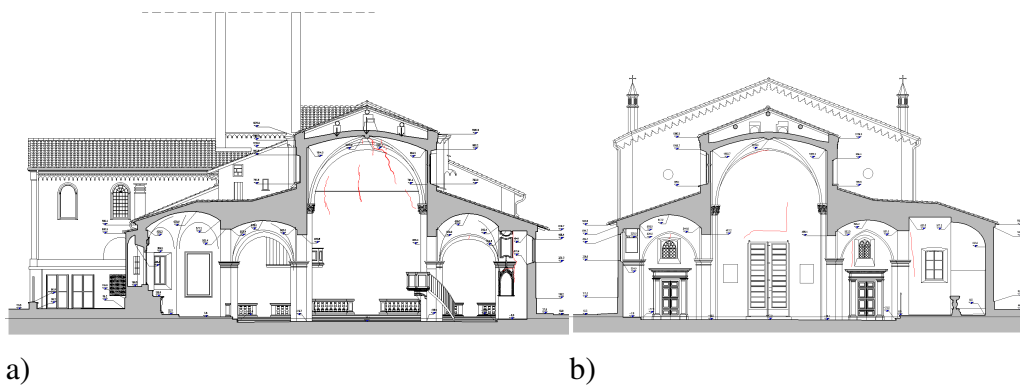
Section view of St. Bassiano showing crack pattern of a) east wall including the apse and b) intrados of the west wall, i.e. the front side of the church.
